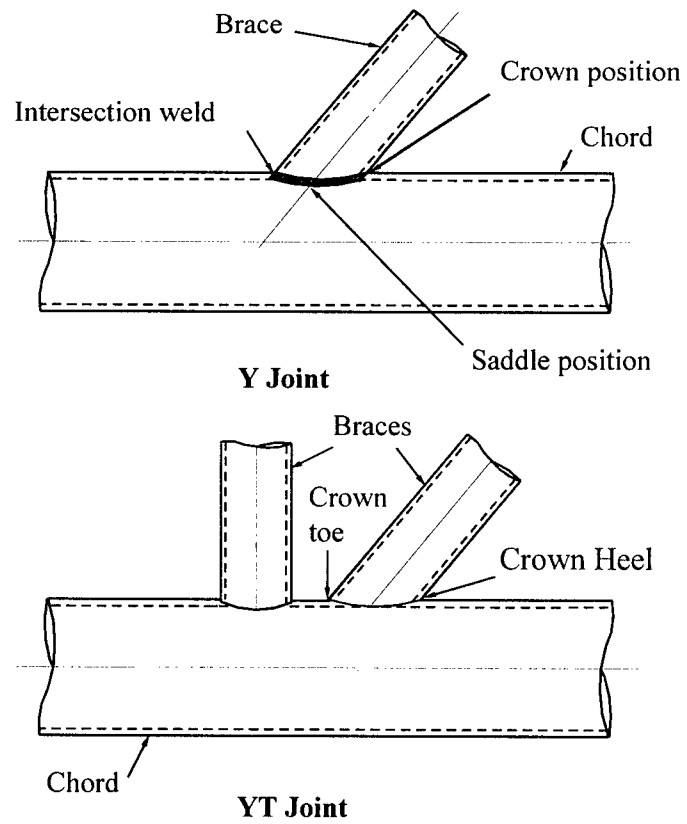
Typical single and multi-welded tubular offshore connections
